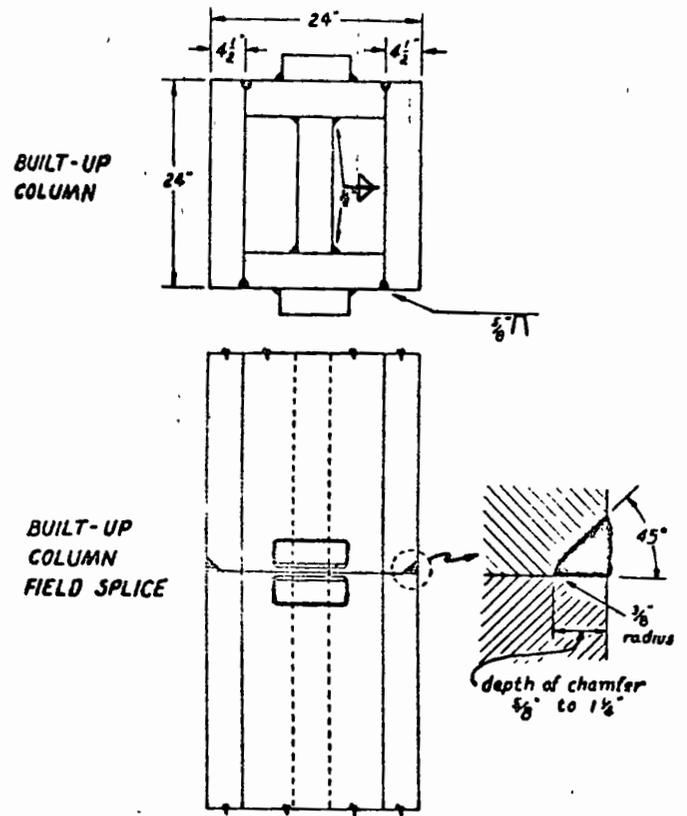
Typical column splice on Michigan Consolidated Gas Co. Building.
